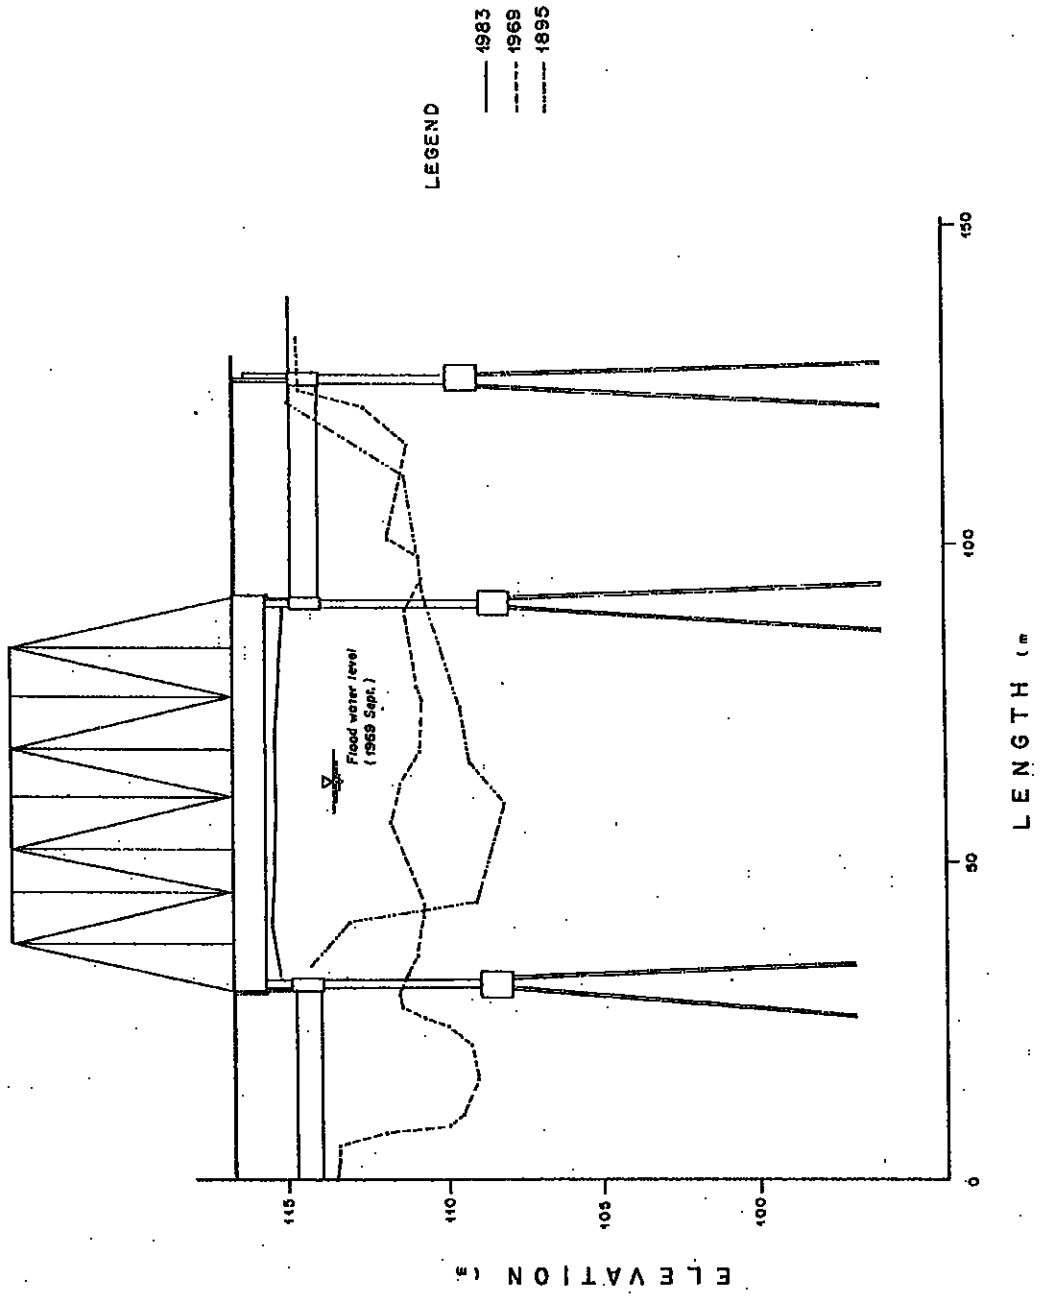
TRANSITION OF CROSS SECTION AT RAILWAY BRIDGE IN ACHIGUATE
